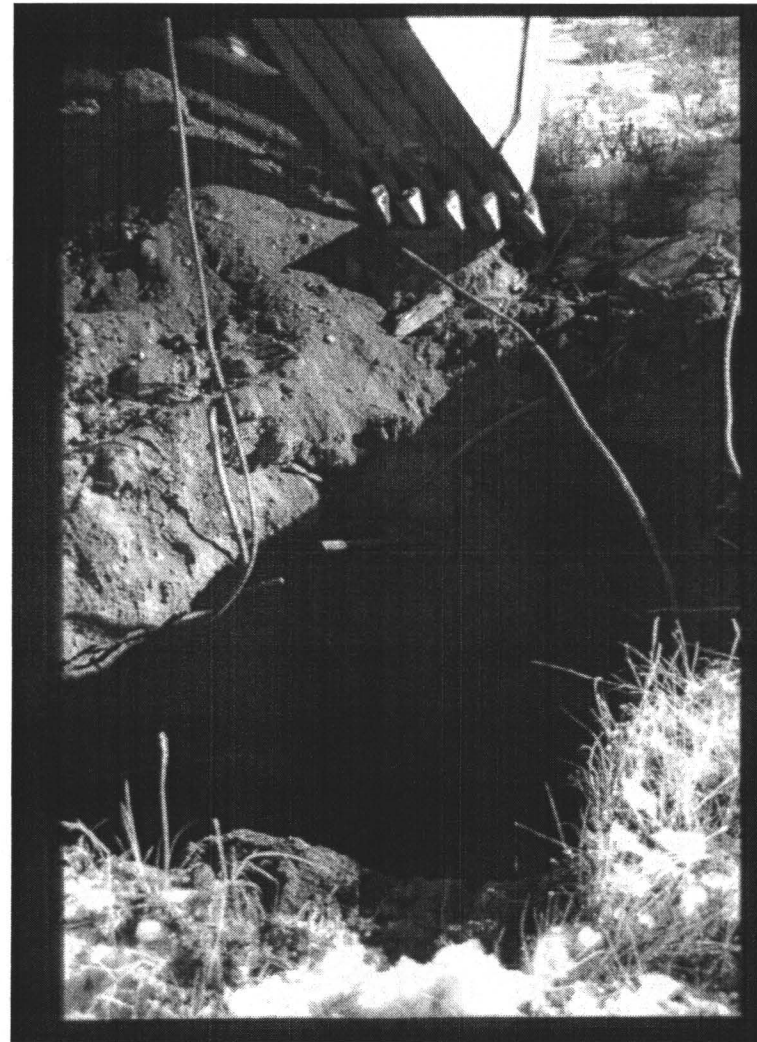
GPR Site #2 from northwest corner looking northeast at Testpit #1.
